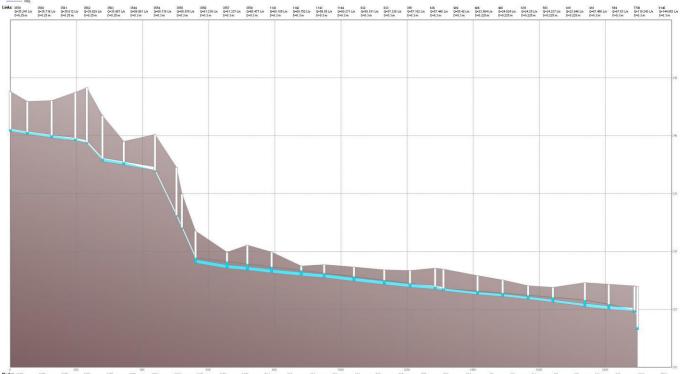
Existing Conditions WWF Results - Area 2 Site Plan 2
